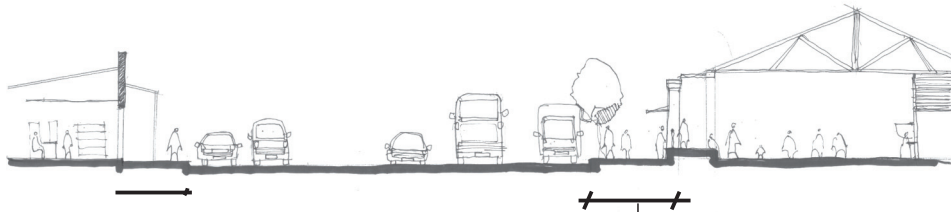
Image showing street plan where street design principles should be implemented (Complete Streets Design Guideline, 2019)
